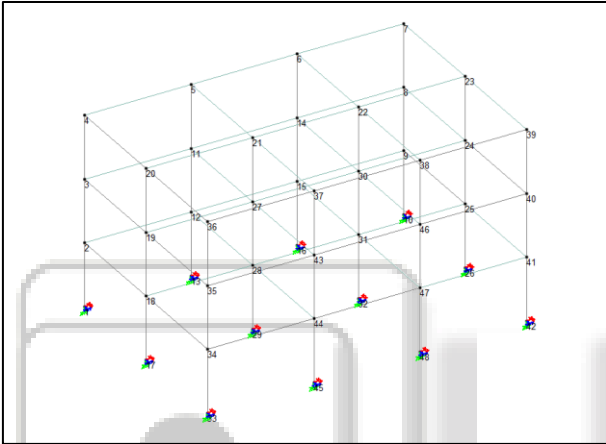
Analytical Model of Reinforced Concrete Frame Structure
